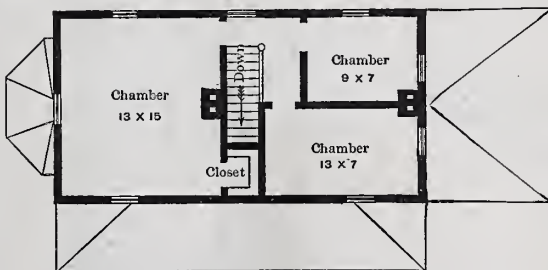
Second Floor Plan.—Scale, 1-16 inch to the Foot.
